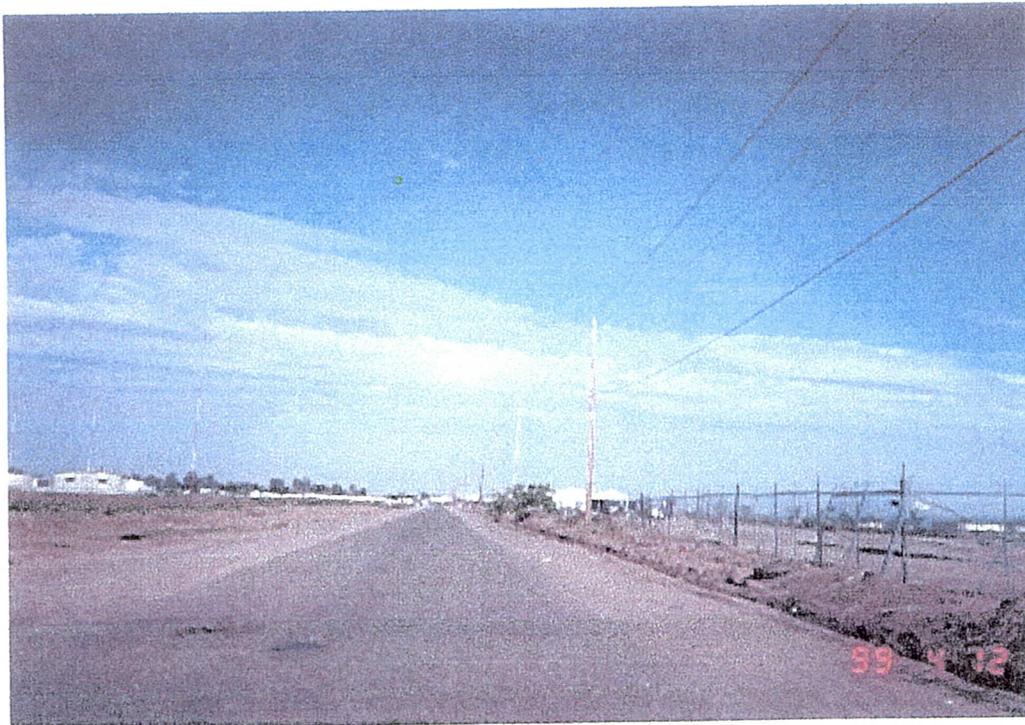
Intersection of Van Buren Street and 91st Avenue (looking south).
